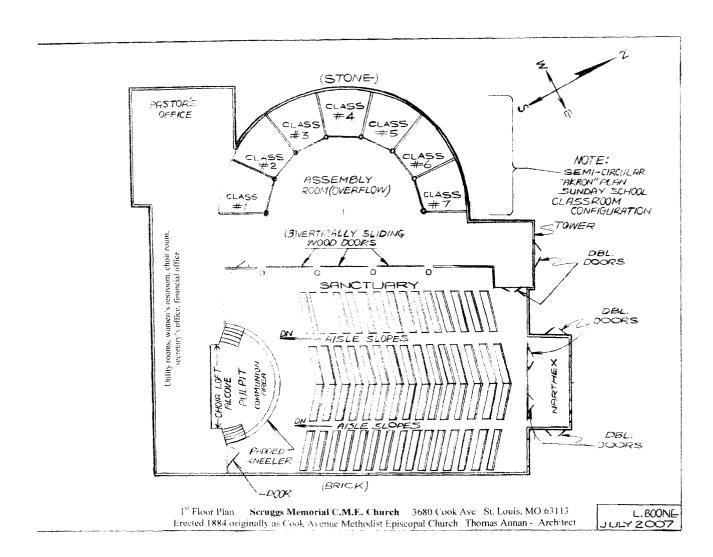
First floor plan, Sunday school, Cook Avenue M.E. Church, St. Louis, Missouri
